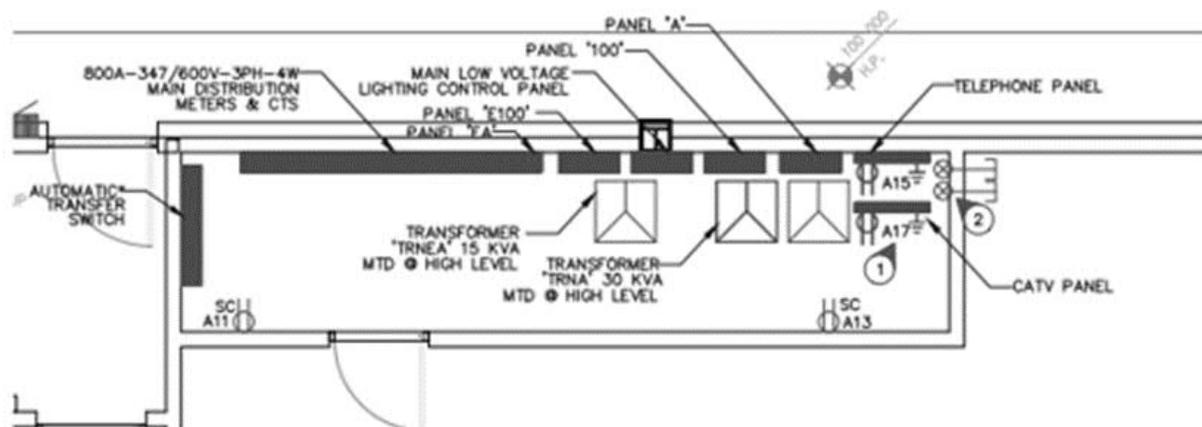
Plan View Layout – Main Floor – Electrical Room #1
